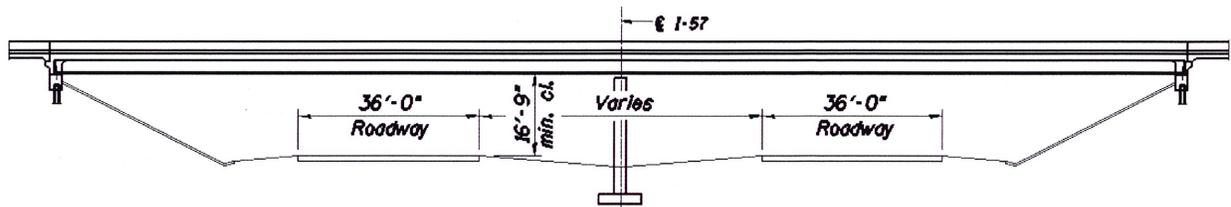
PROPOSED TYPICAL OVERHEAD STRUCTURE REPLACEMENT
